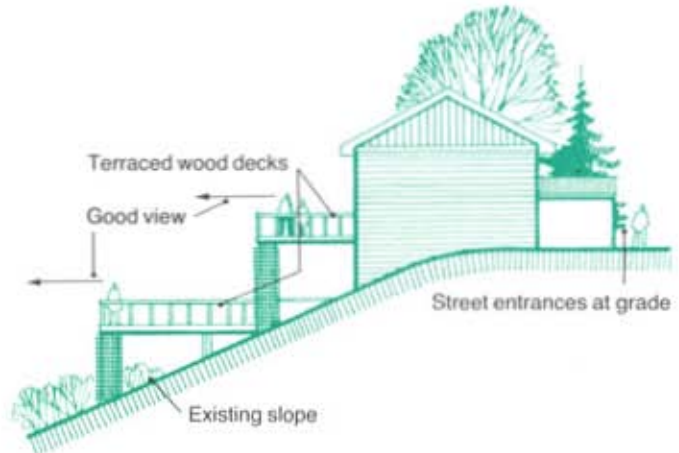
Terracing with wood decking on a steep slope creates more space and eliminates the need for expensive retaining walls.
